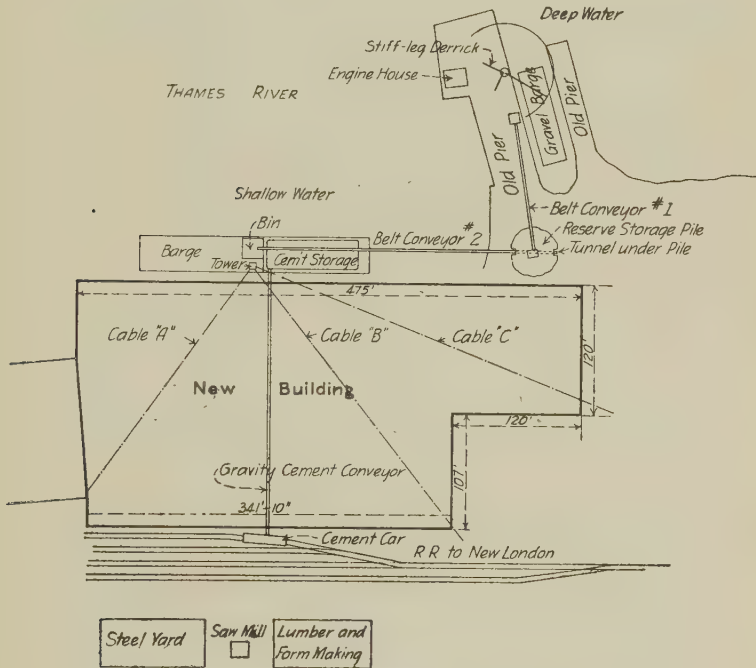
PLOT PLAN ROBERT GAIR CO., MONTVILLE, CONN.
